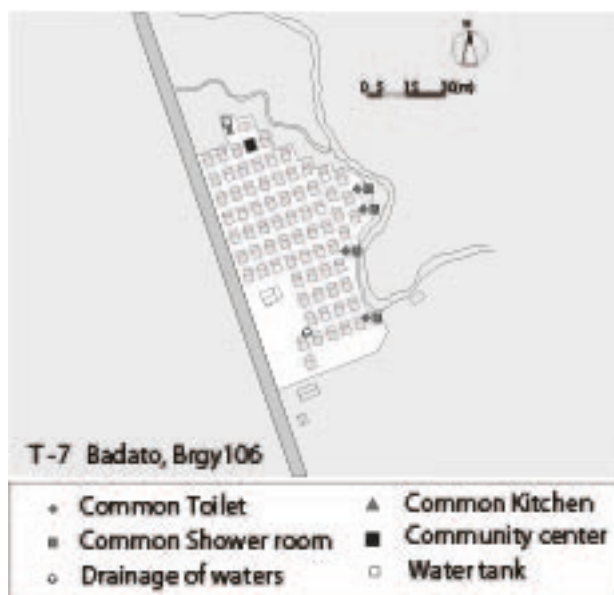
14: Site Development Plan of T7 – Sto. Niño Badato
